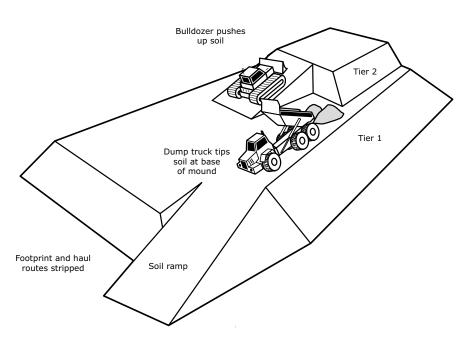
Soil storage mound construction with bulldozers and dump trucks: Multi-tier mound...
